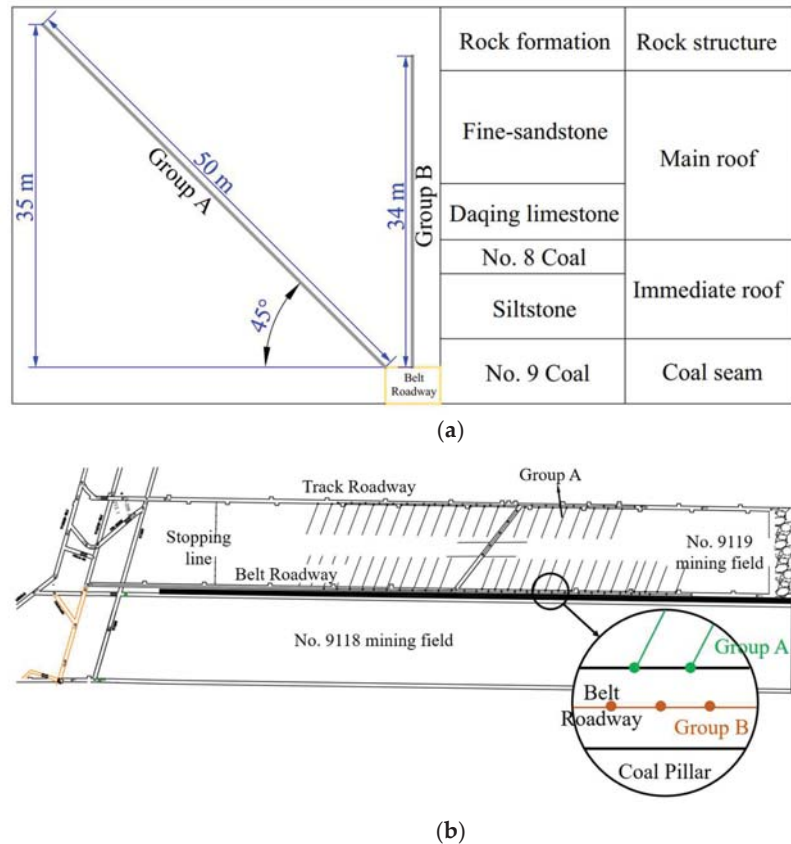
Layout of holes: (a) sectional view; (b) top view.
